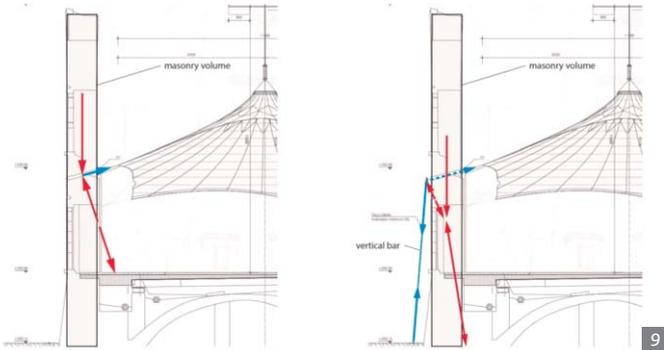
Strut-and-tie model of the reaction introduction: without reinforcement (left) and with external bars (right) © Ney & Partners
